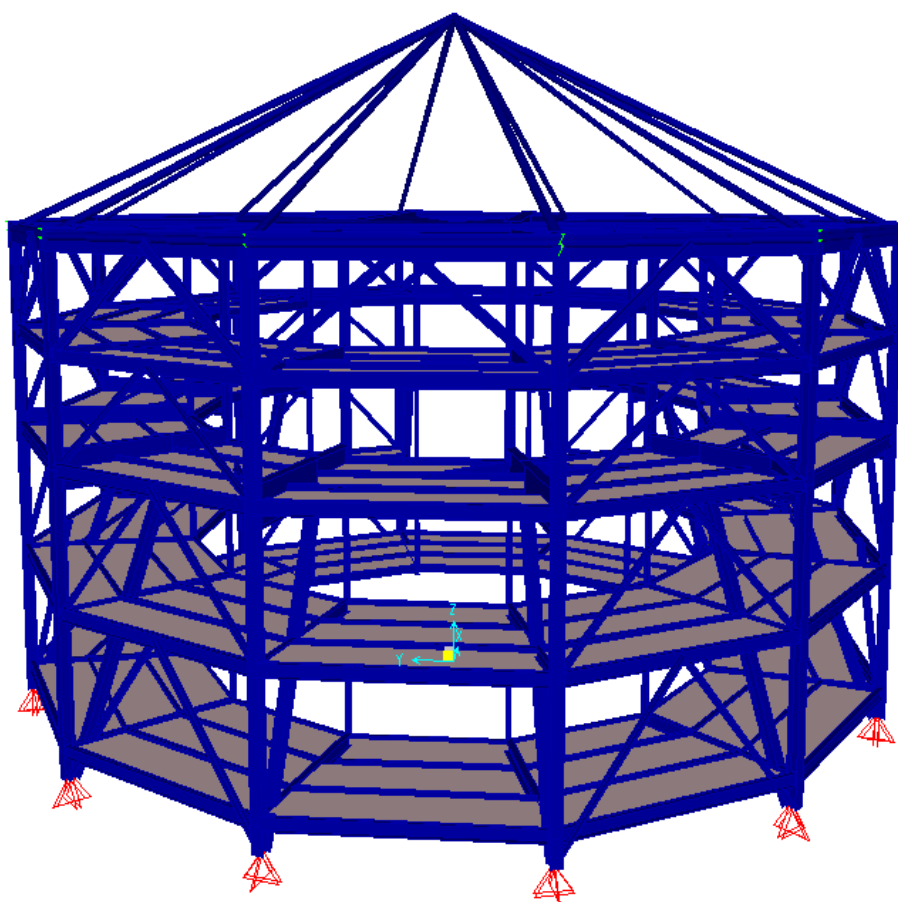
SAP2000 isometric 3-D view of outer pier steel frame and slabs
